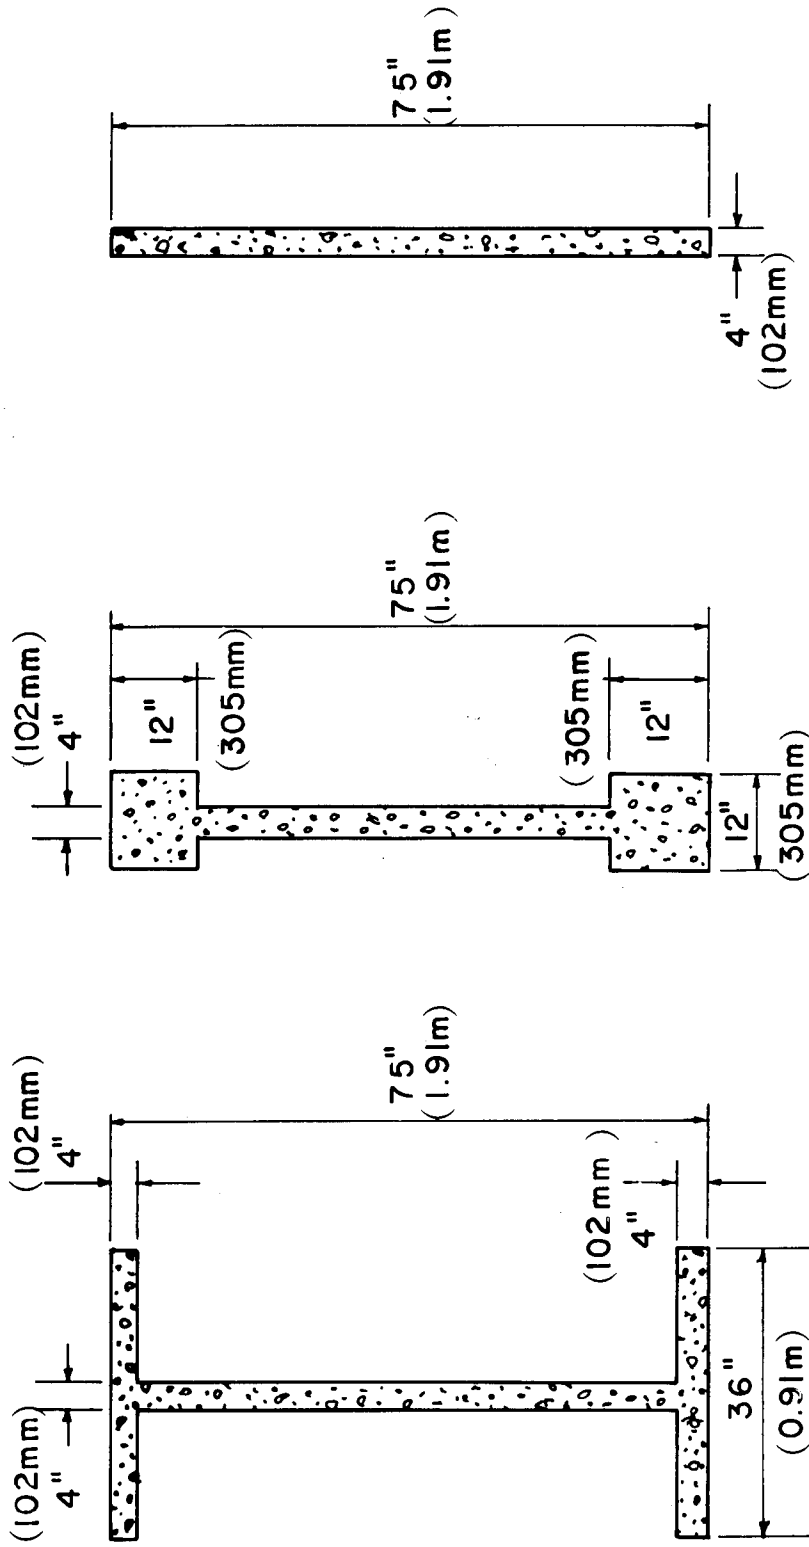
Nominal Dimensions of Test Specimen with Rectangular Cross Section
